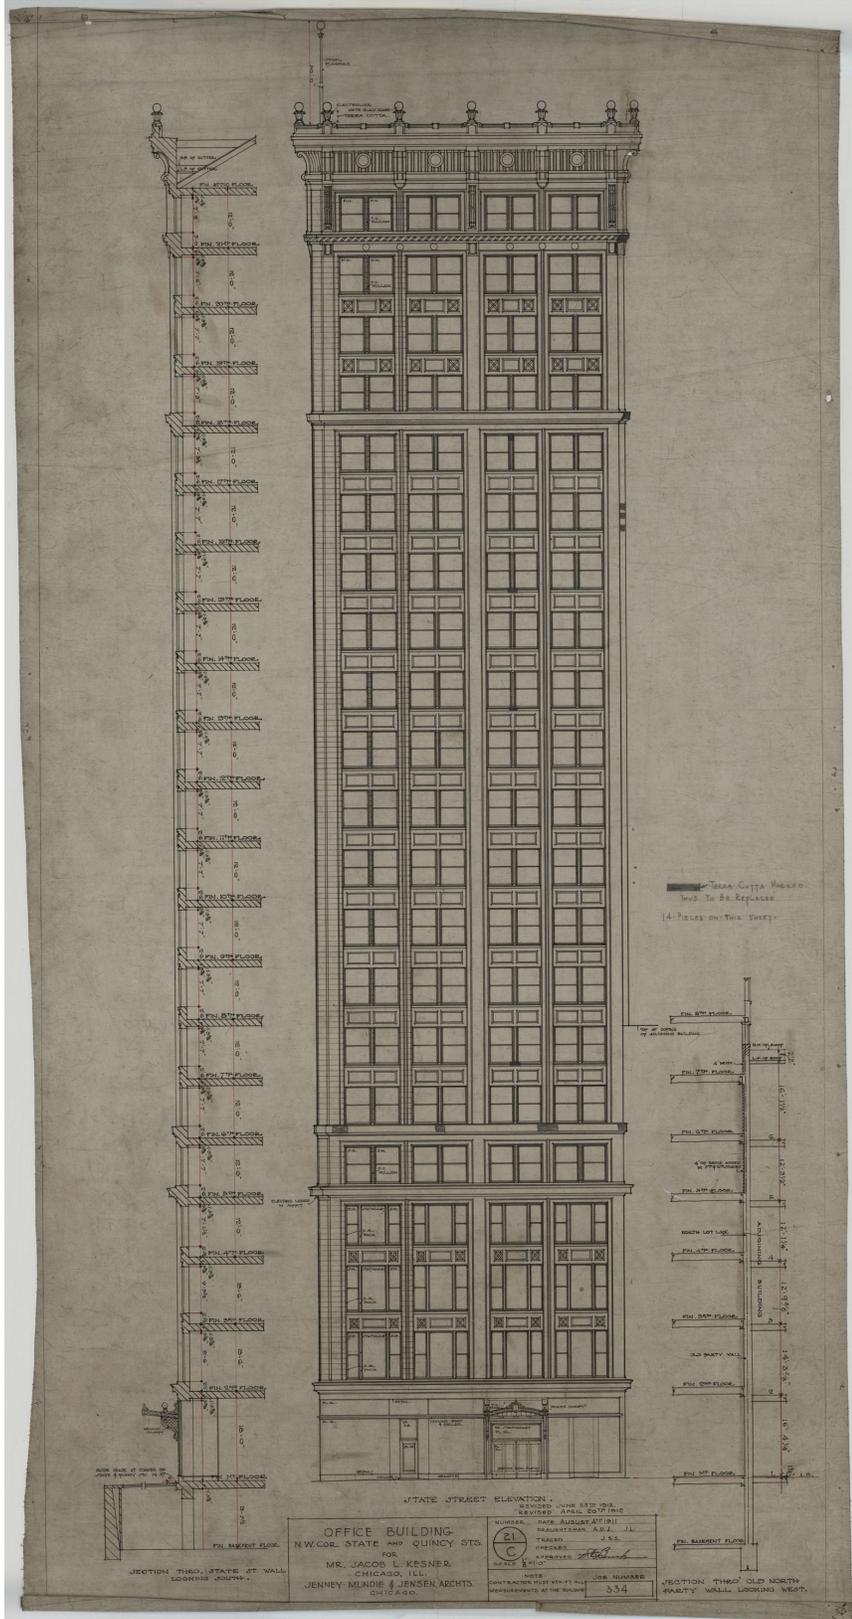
Original drawing of east façade, Jenney, Mundie & Jensen, 1911.
